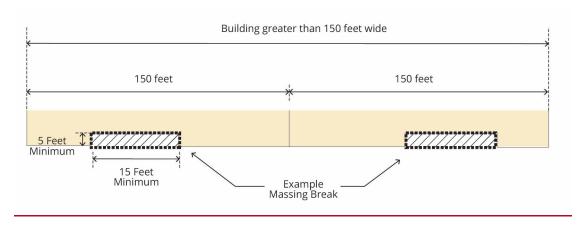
C MULTI-UNIT DWELLINGS, MASSING INCREMENT
